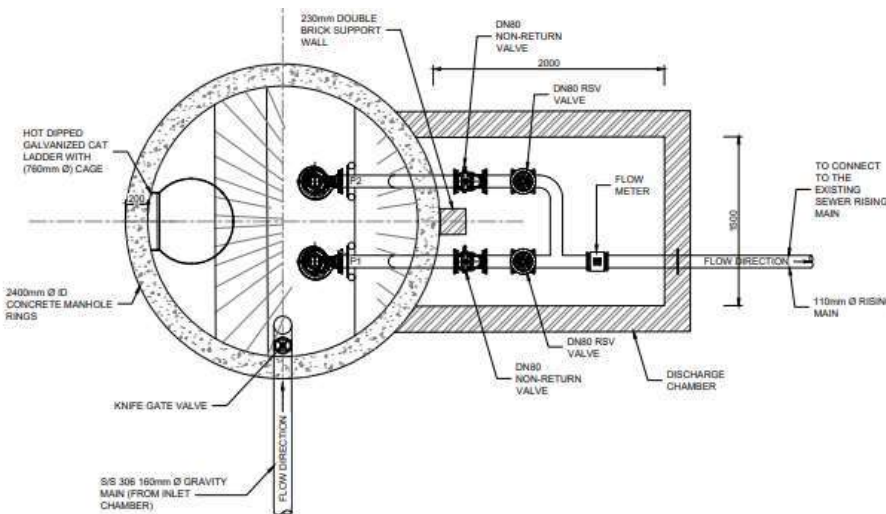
Plan view of the Pump Station & Valve Chamber
